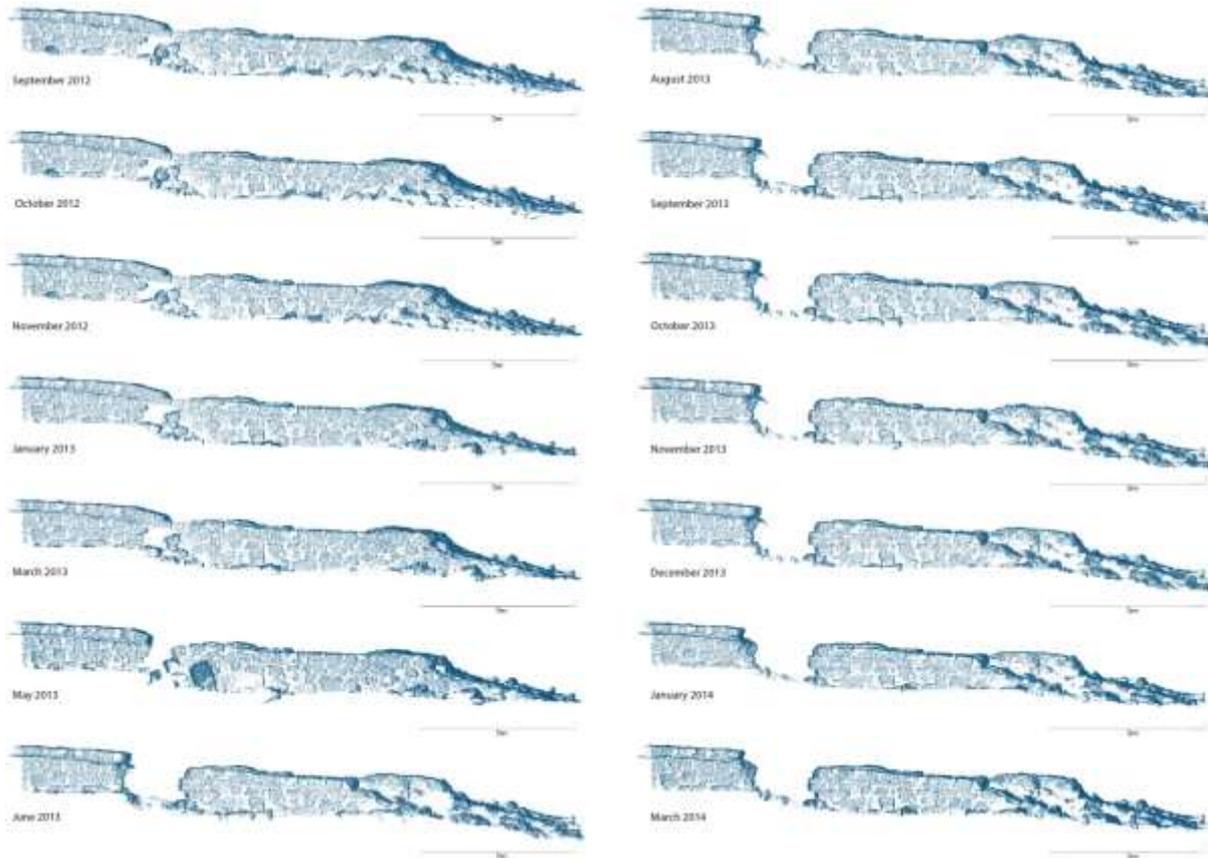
TLS point clouds showing the progressive collapse of sections of the north facing elevation of the upper dressing floor retaining wall at Whitesike Mine. Sequence is read from top to bottom, column by column.
